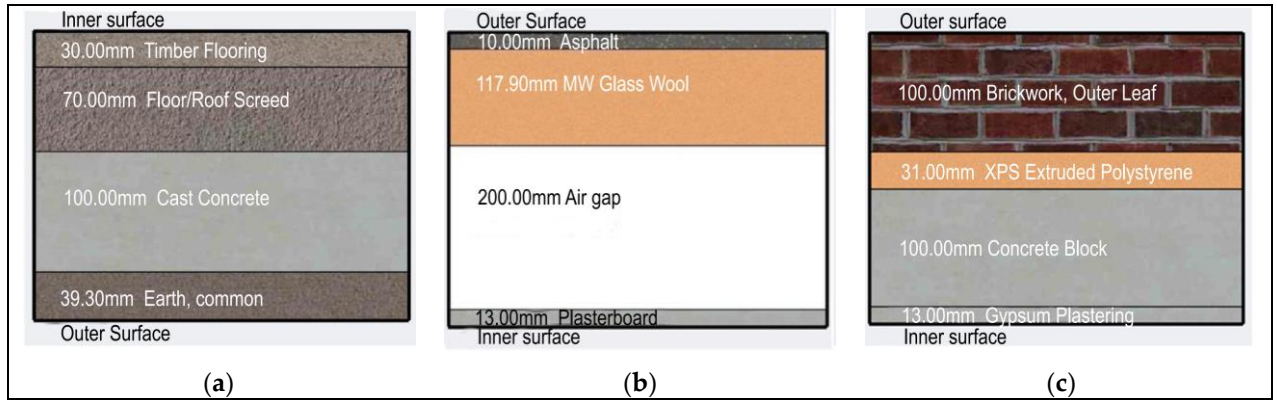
Construction details and layers of (a) ground floor; (b) external roof; and (c) external wall.
